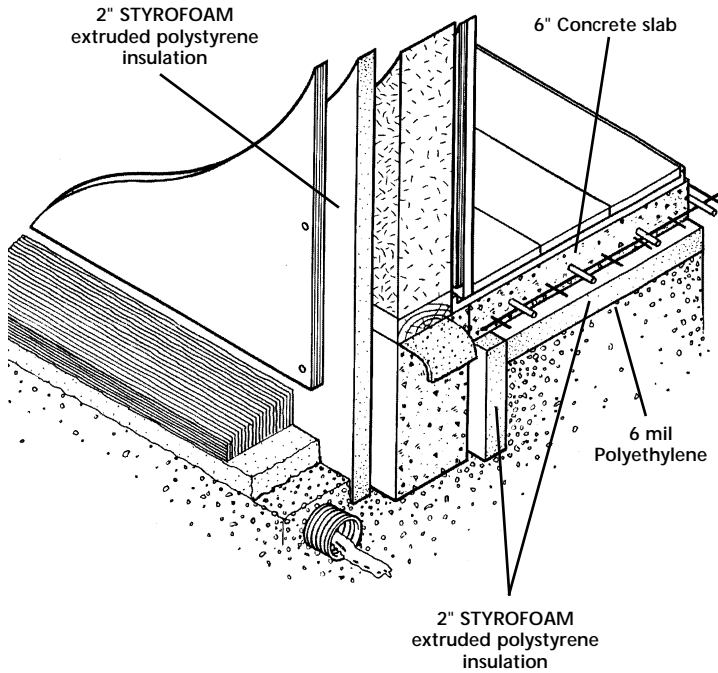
Insulating edges and under slab in a slab-on-grade radiant floor design
